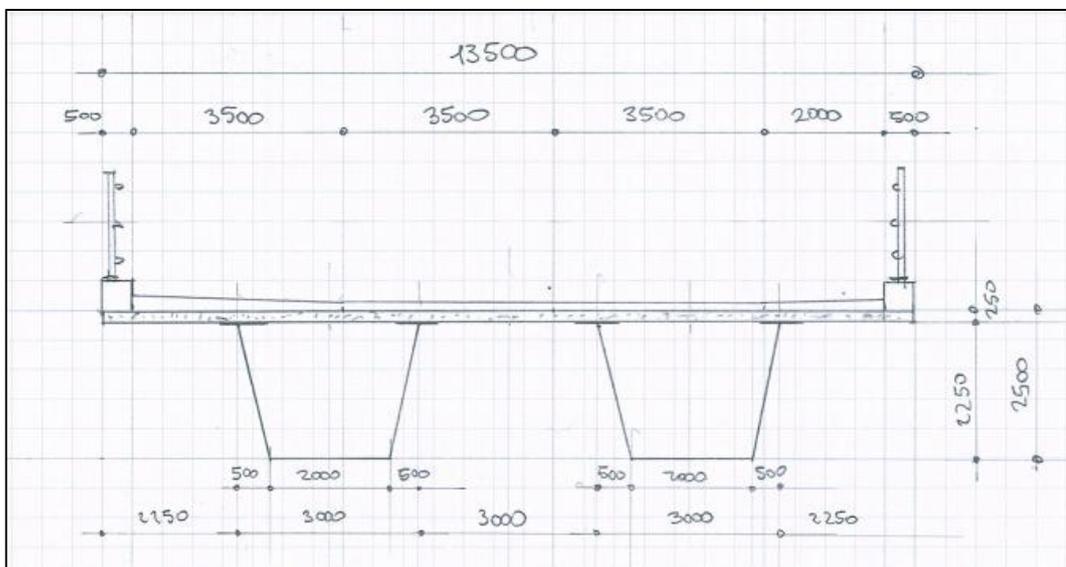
Composite steel box girder deck cross section – All dimensions are indicative.
